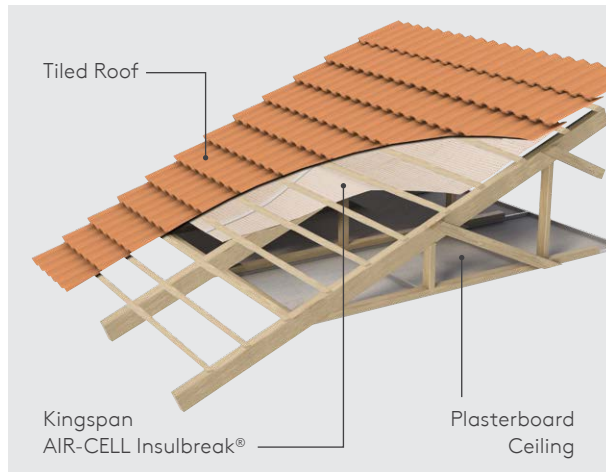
Kingspan AIR-CELL Insulbreak® 55 in a timber framed tiled roof with an attic space and a flat ceiling.
